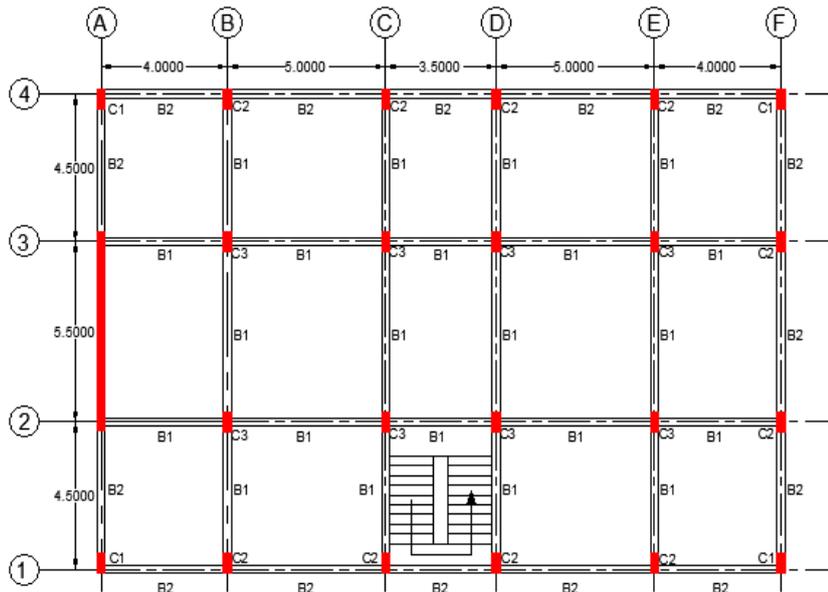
(b). Floor plan for G+4 storey irregular RC frame.
